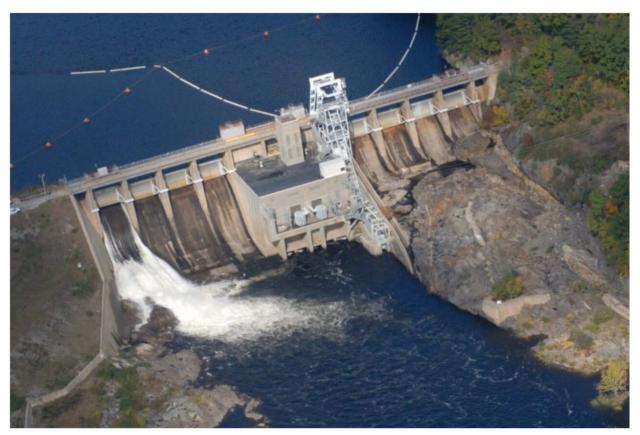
Photograph of Skelton Project (aerial) showing the Impoundment, Dam, Powerhouse, and Tailrace.
